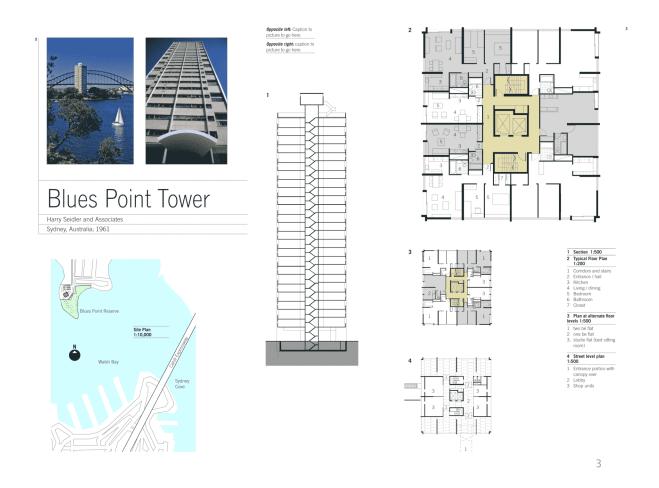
Extract from Key Urban Housing of the Twentieth Century: Plans sections and elevations Laurence King (UK) Norton (USA) 2009. Chapter 4 Alternatives, page 128.
